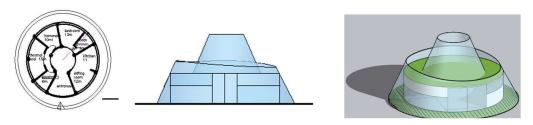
the third type of bungalows (3d view, plans, and façade
